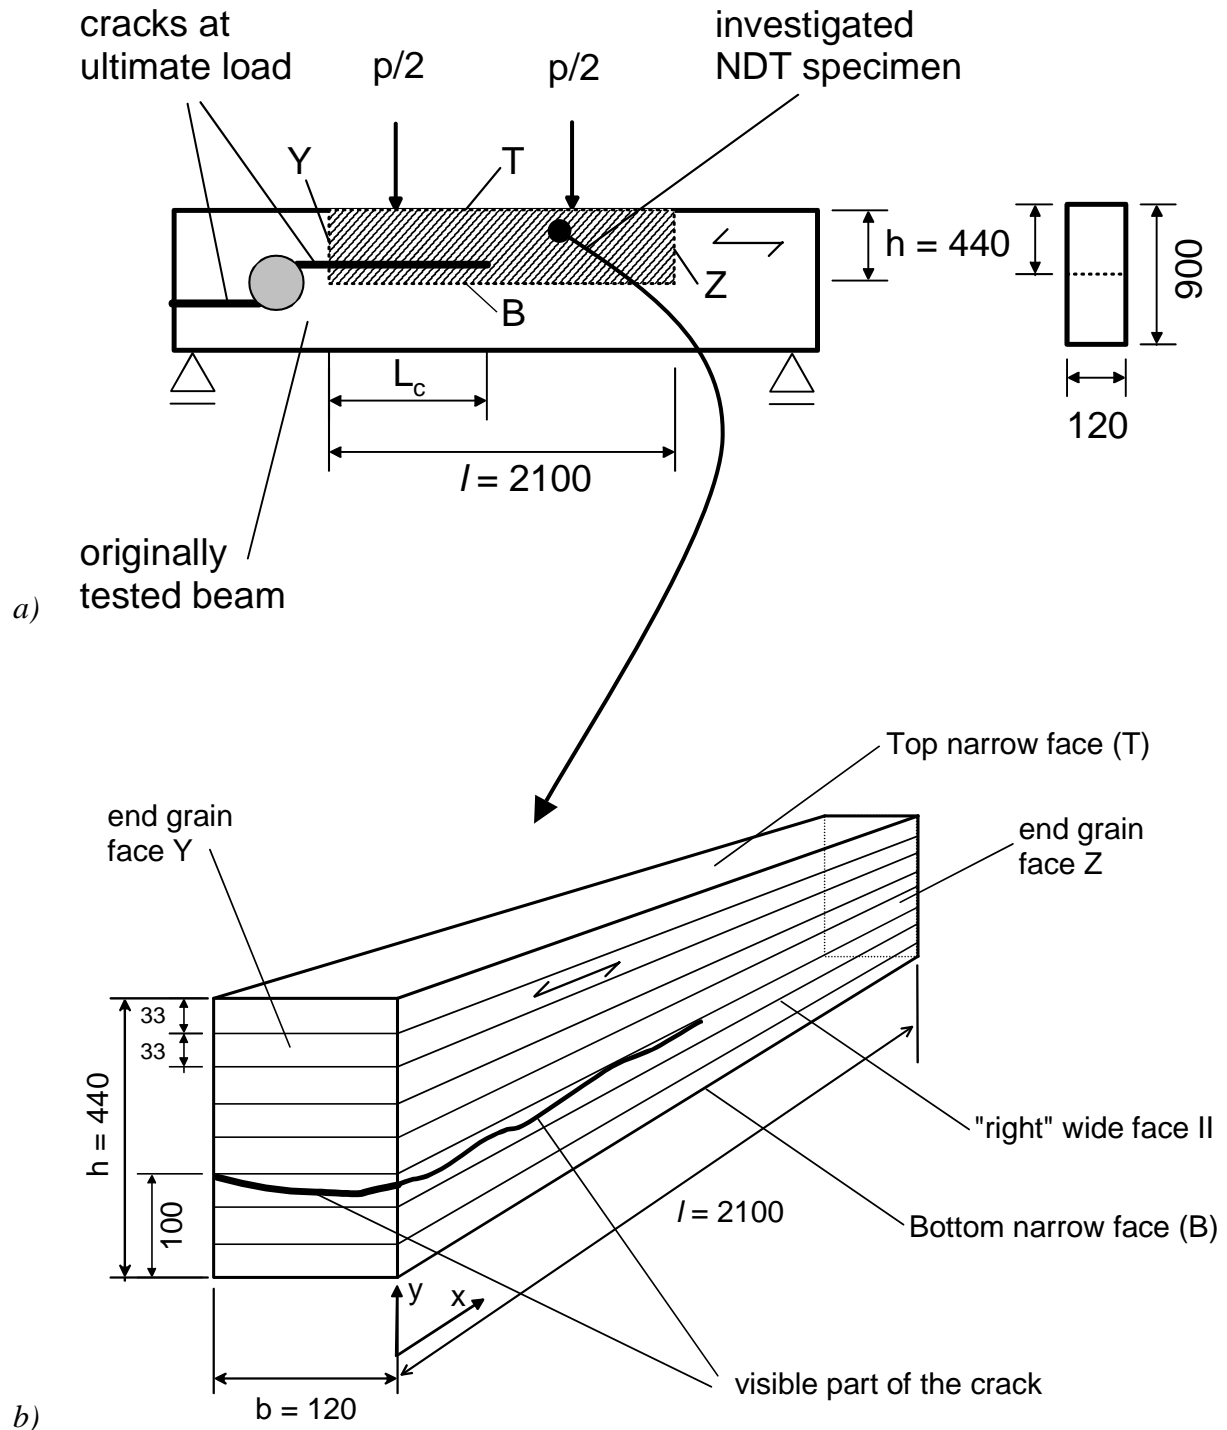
,b: Original location and dimensions of the employed NDT specimen.
